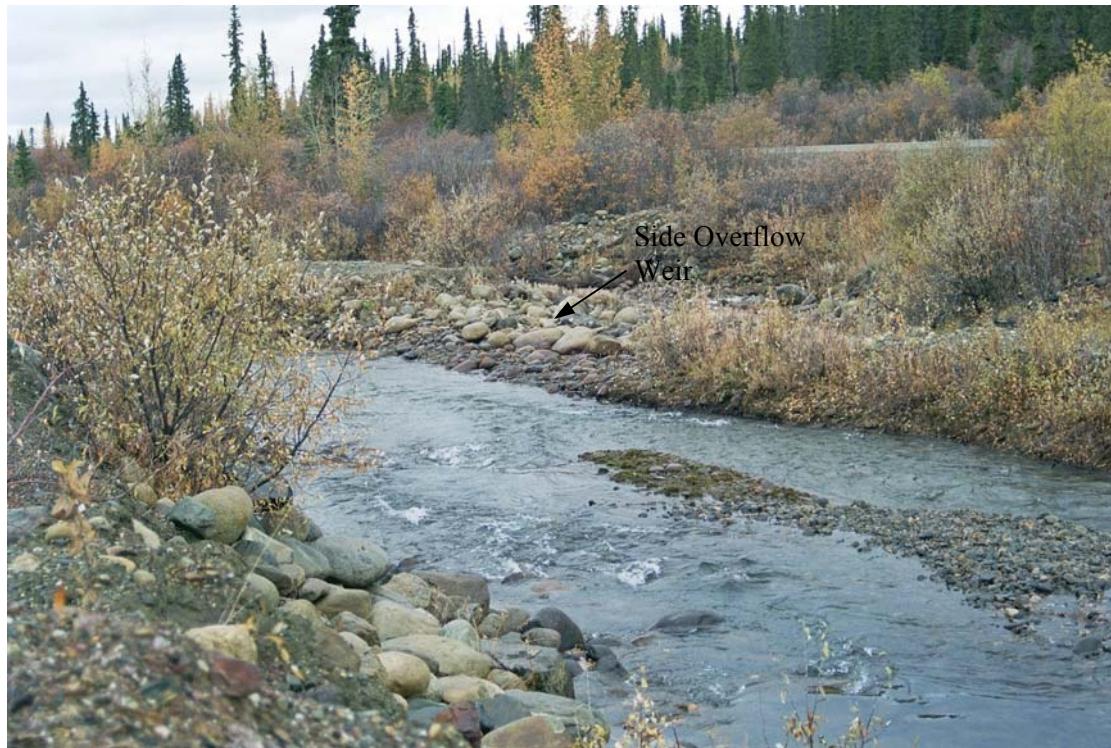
View across North Fork Rose Creek to the side overflow weir in the centre of the photo, that allows excess flow to enter the North Fork Diversion. Creek flow passes into the downstream series of four Recharge Ponds and finally the Pumphouse Pond.
